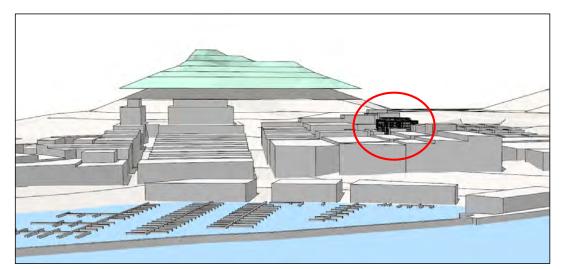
Elevated foreshore view extracted from Town Centre Model (proposed building in red)
